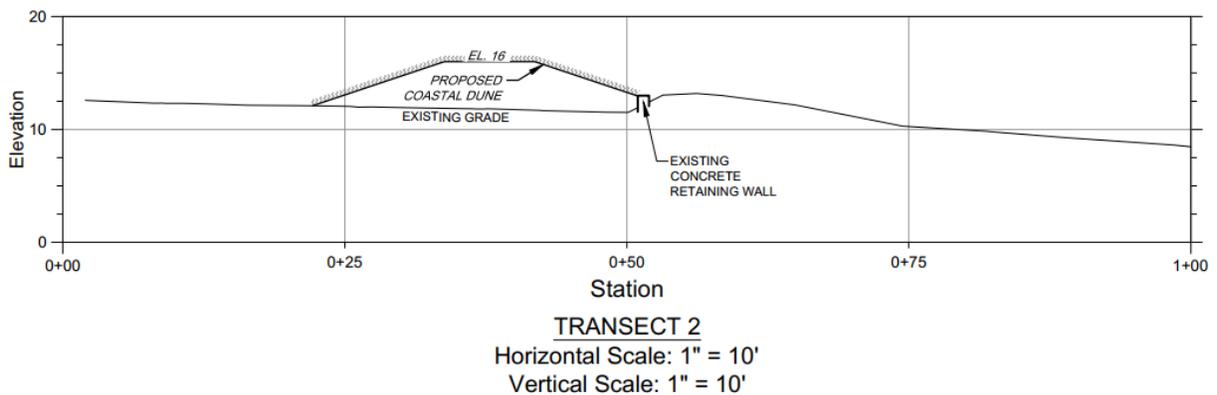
Engineering design at Transect 2 for the proposed dune restoration at 131-145 Beach Ave (location of Transect 2 shown on the engineering plans in Section G).
